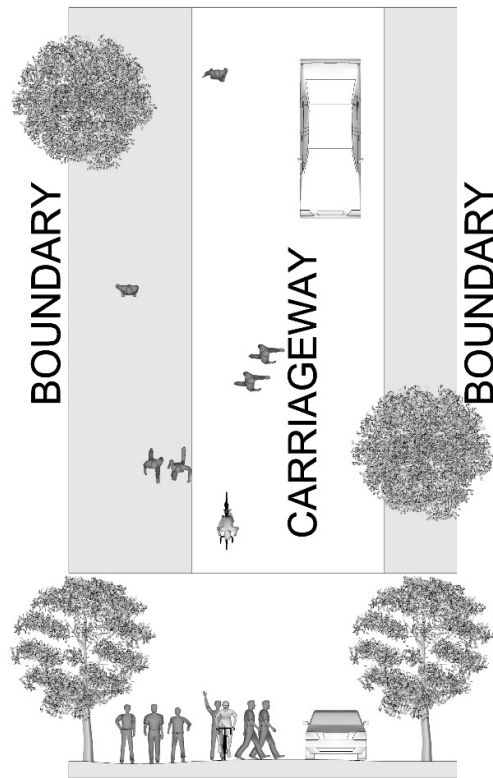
Suburban, live and play, access to houses/townhouses (1 to 20 du)
